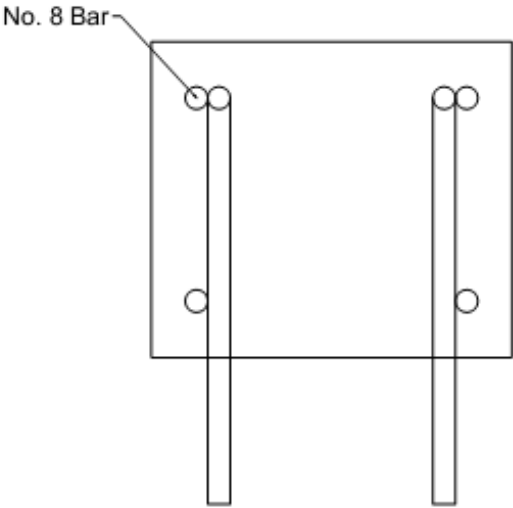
Longitudinal column reinforcement-4 No. 8 bars. Transverse reinforcement not shown.
